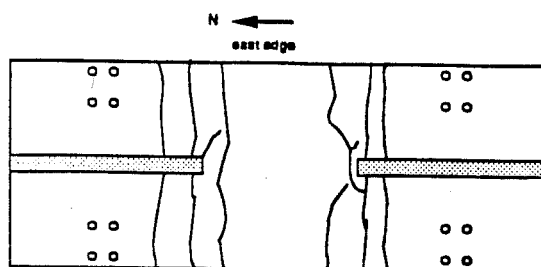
Sp. 2a: Progression of Cracking of Top Face of Second Floor Slab at Load Point 284
